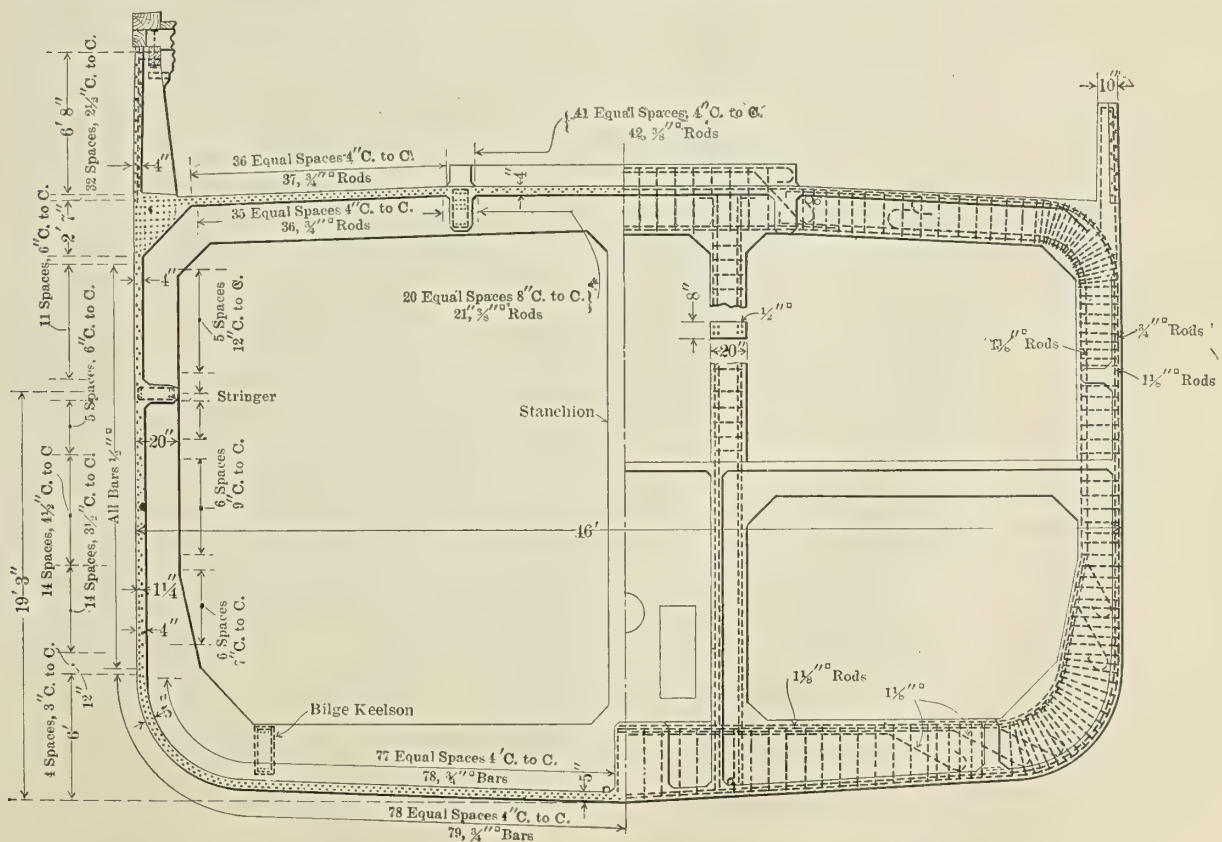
Midship Section, Showing Shell Reinforcement and Frame Details
